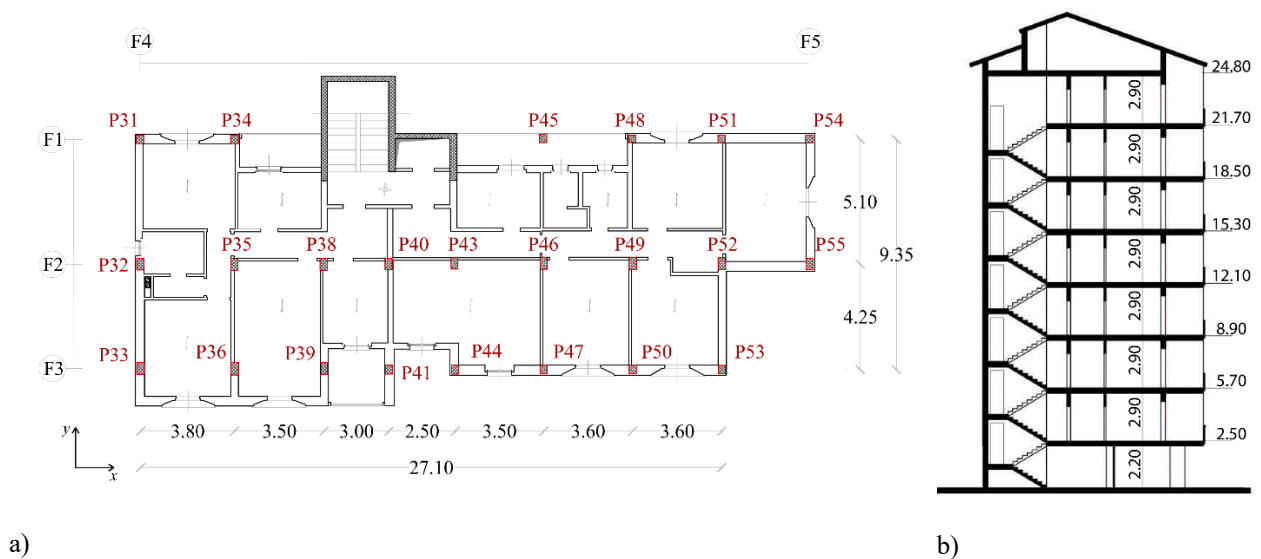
Plan of a reference floor (left); Transversal section of the reference building (right).
